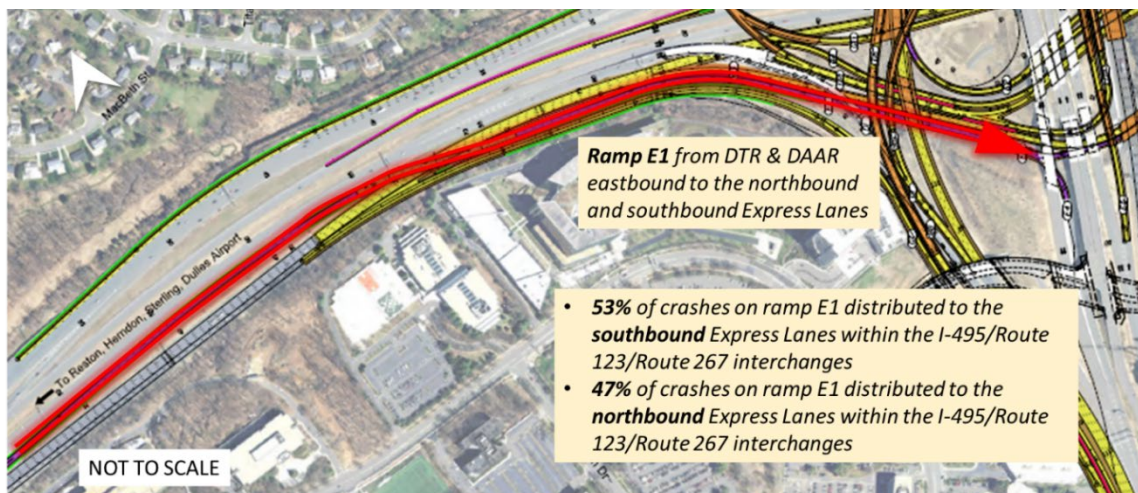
Route 267 Interchange Zone: Spring Hill Road and Dulles Toll Road
